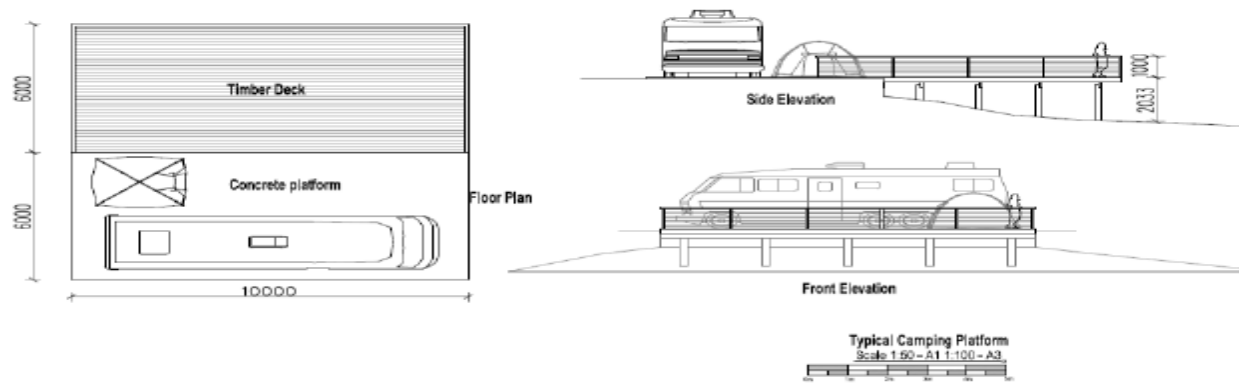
Dimensions of camping platforms, TMBA Architects, 2023.
